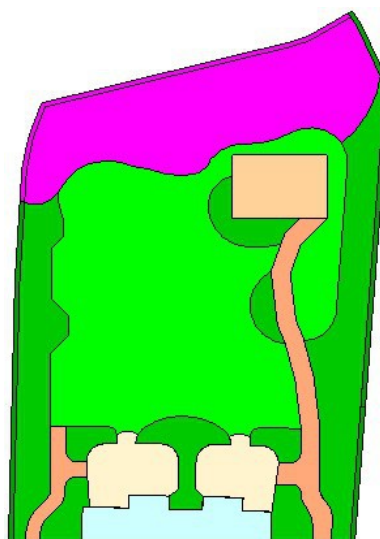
above shows that the Prunus (T7) can now be retained.
